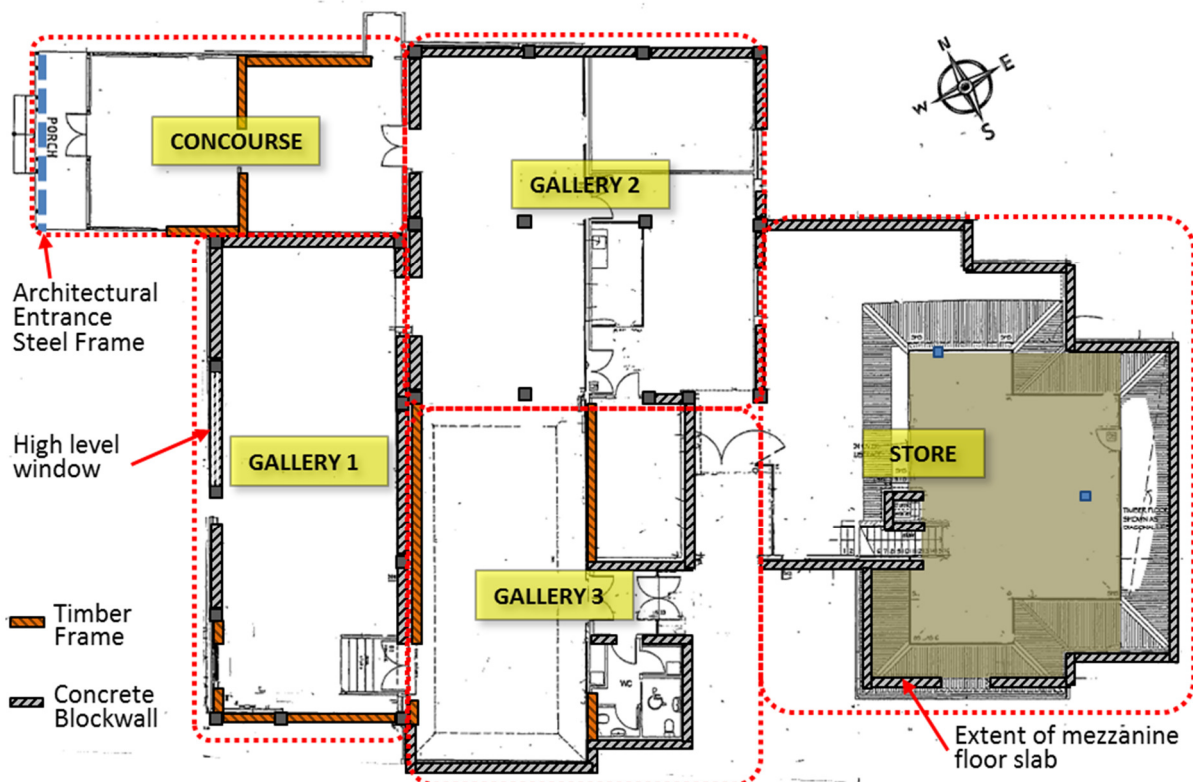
Building Layout Showing Key Lateral Load Resisting System
